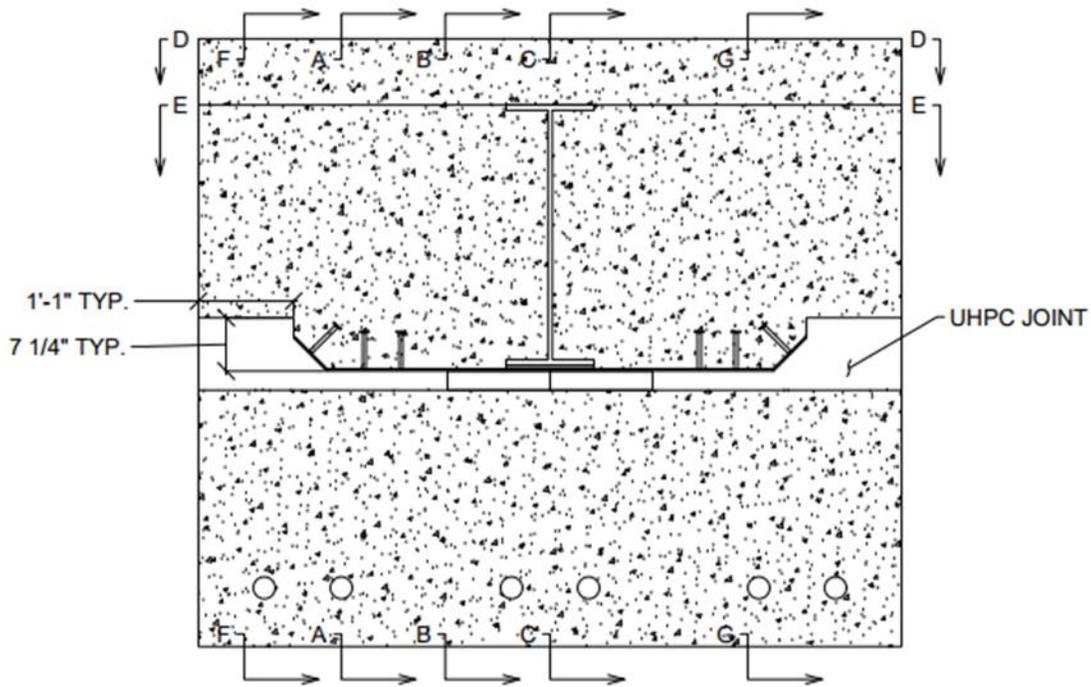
UHPC joint specimen front view showing “sliding shoes” and pads
